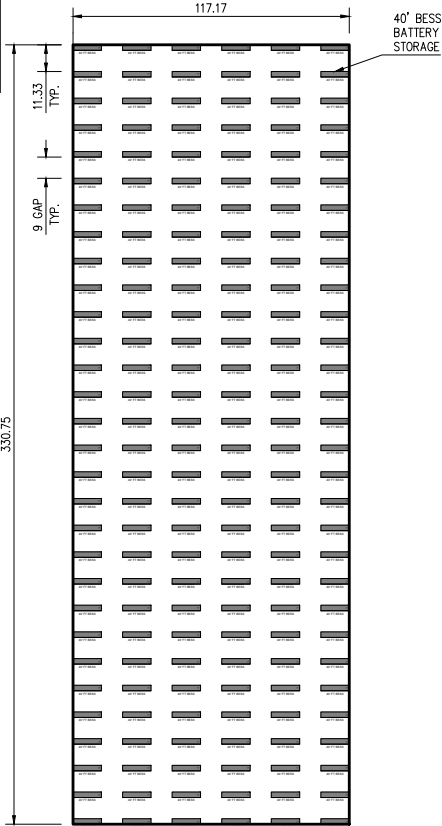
PROPOSED SITE LAYOUT OF MODIFIED DEVELOPMENT - CENTRALISED BESS OPTION
